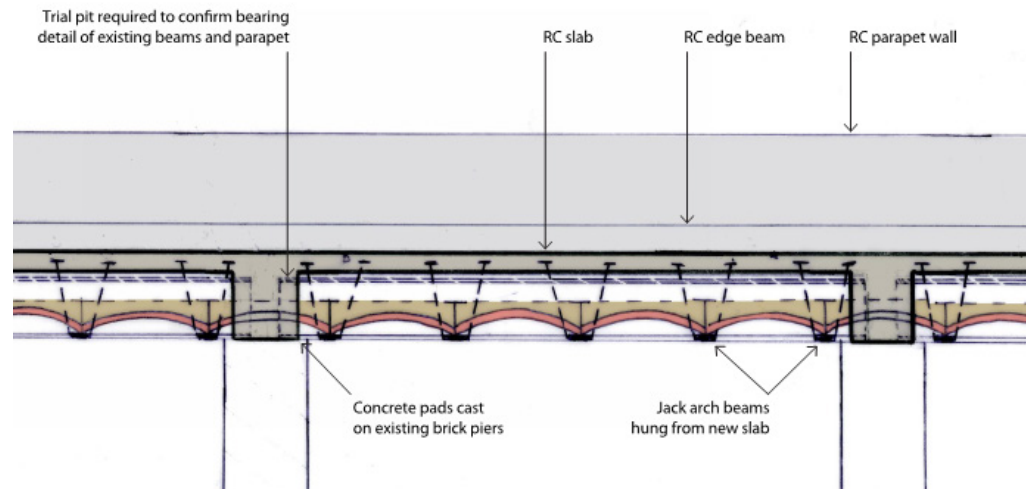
Longitudinal section through proposed jack arch over decking
